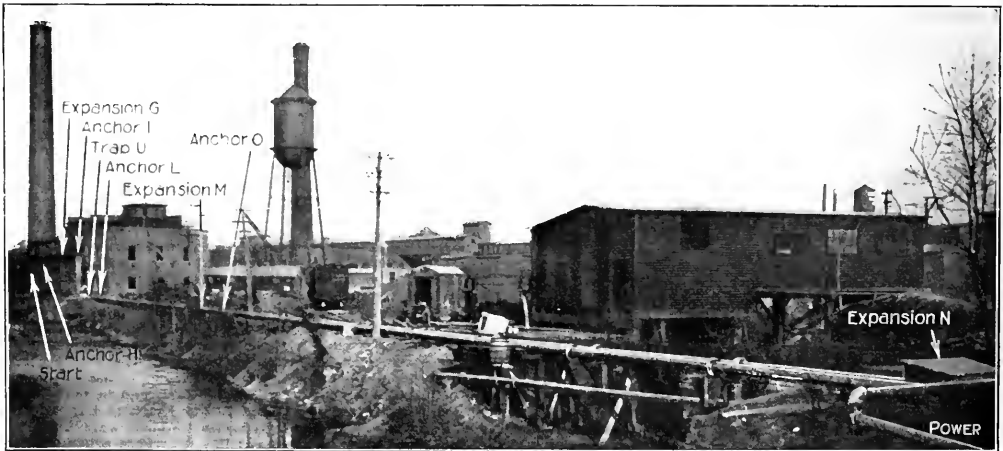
STEAM MAINS FROM MILL BOILER PLANT
